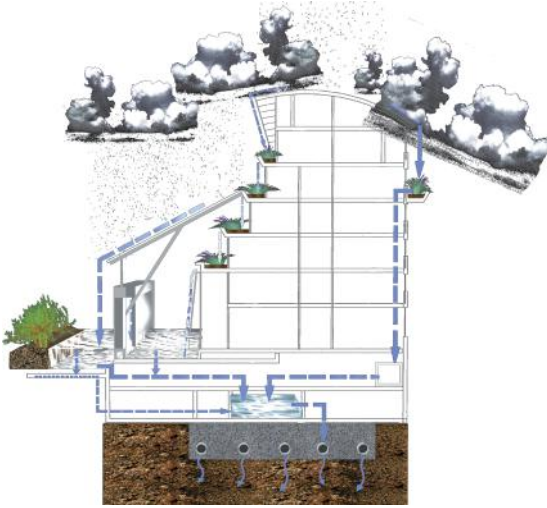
Rooftop water is collected on a glass roof and used for irrigation and in a waterscape of creeks and ponds. (*Atelier Dreiseitl*)
